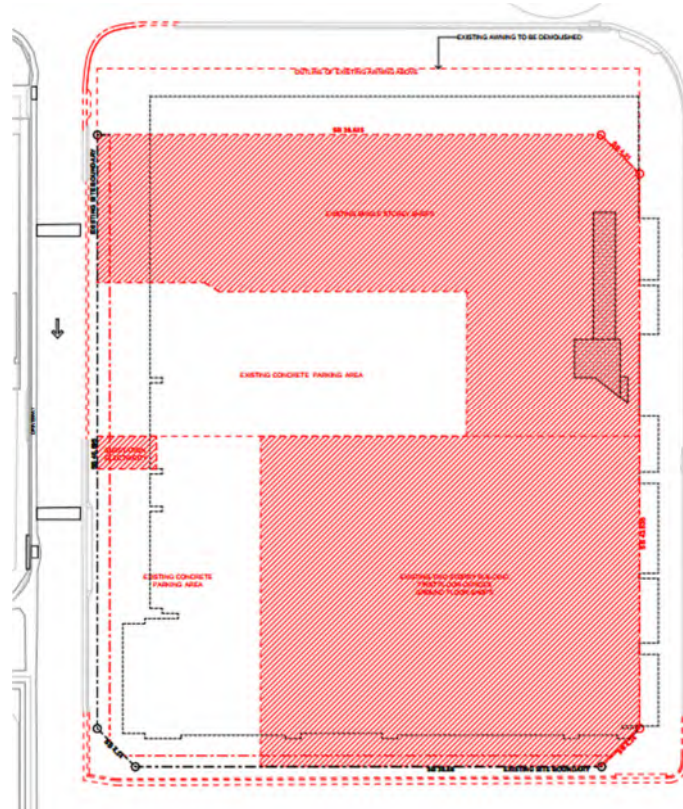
Demolition Plan extract showing the proposed demolition works within the subject site.
